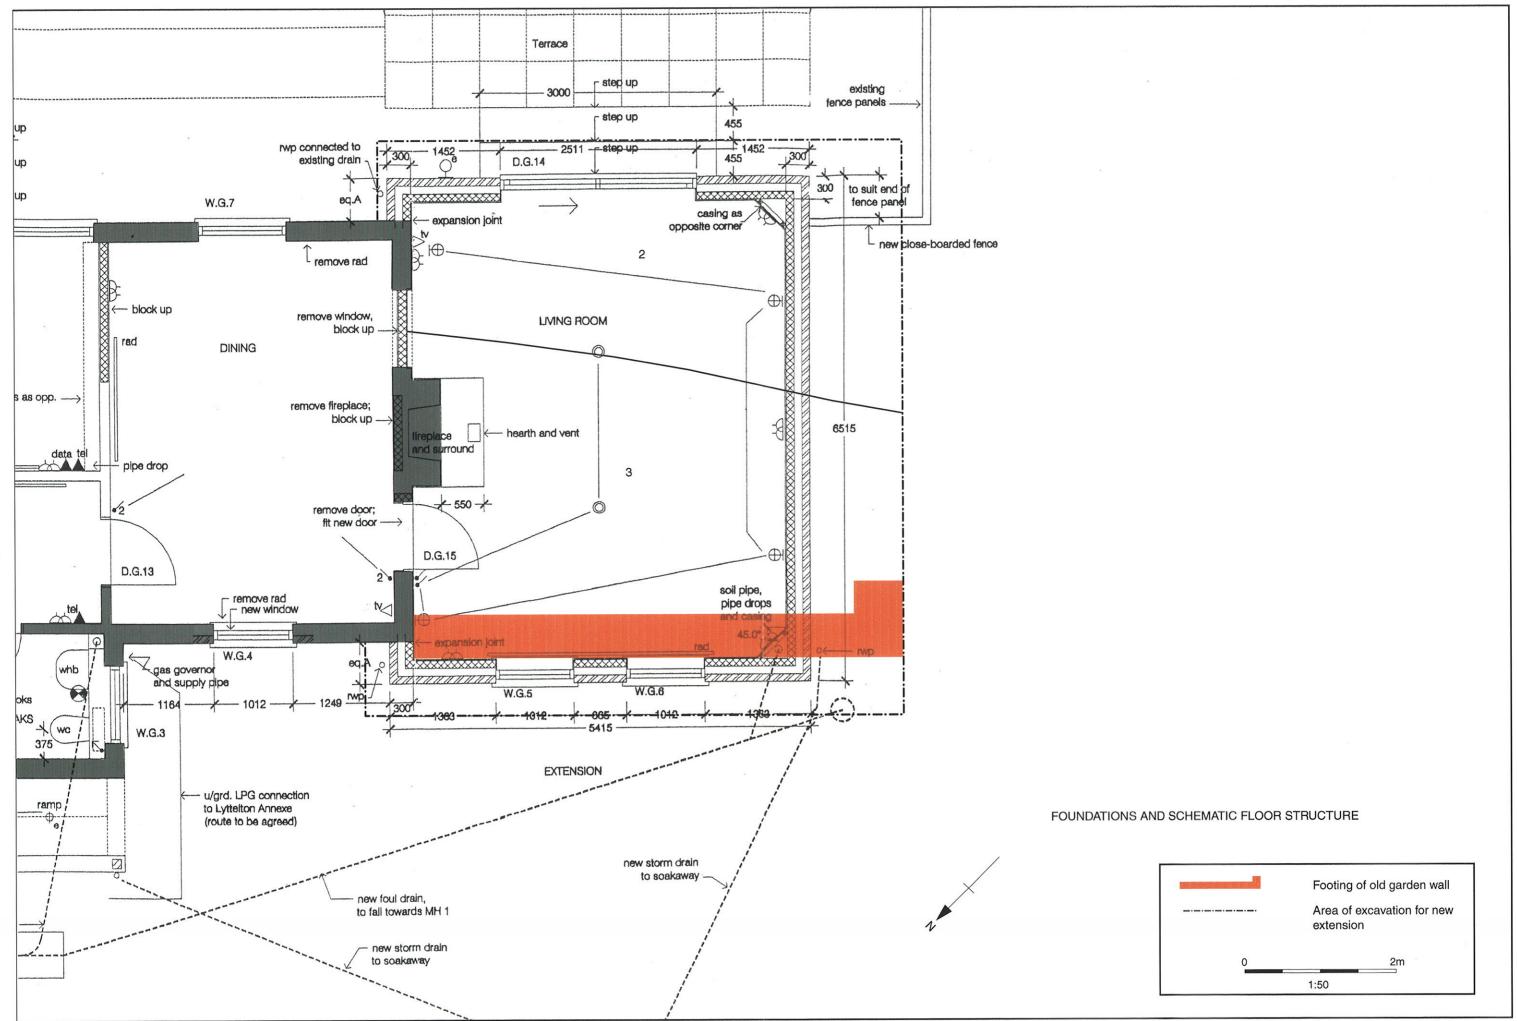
Plan of Area of Watching Brief Showing Contexts 2 and 3
